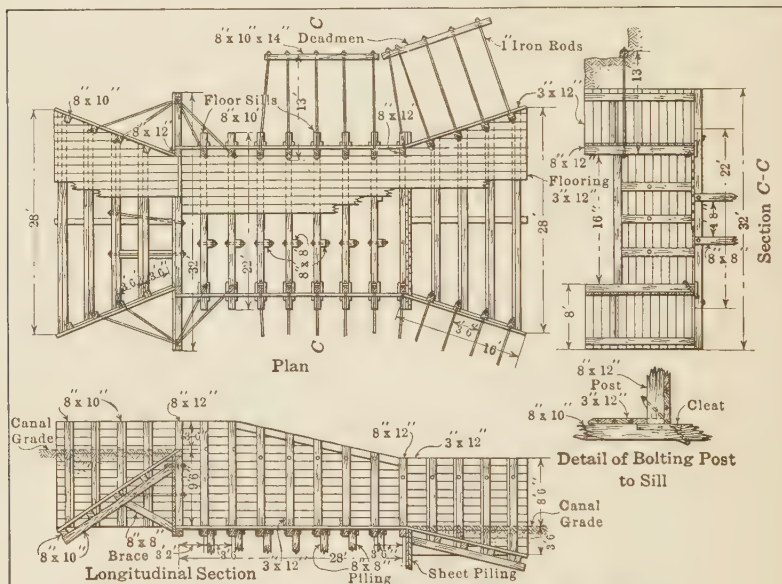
Wooden drop. Corinne Canal, Utah Sugar Co.
